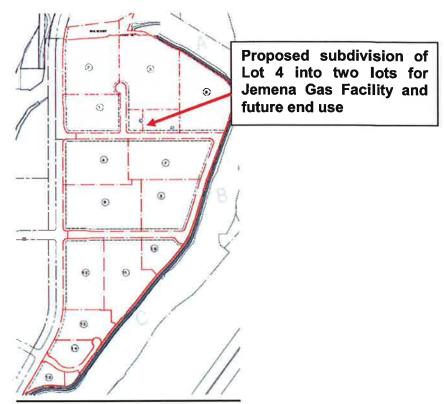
Proposed subdivision plan - Super lot A MOD 6
